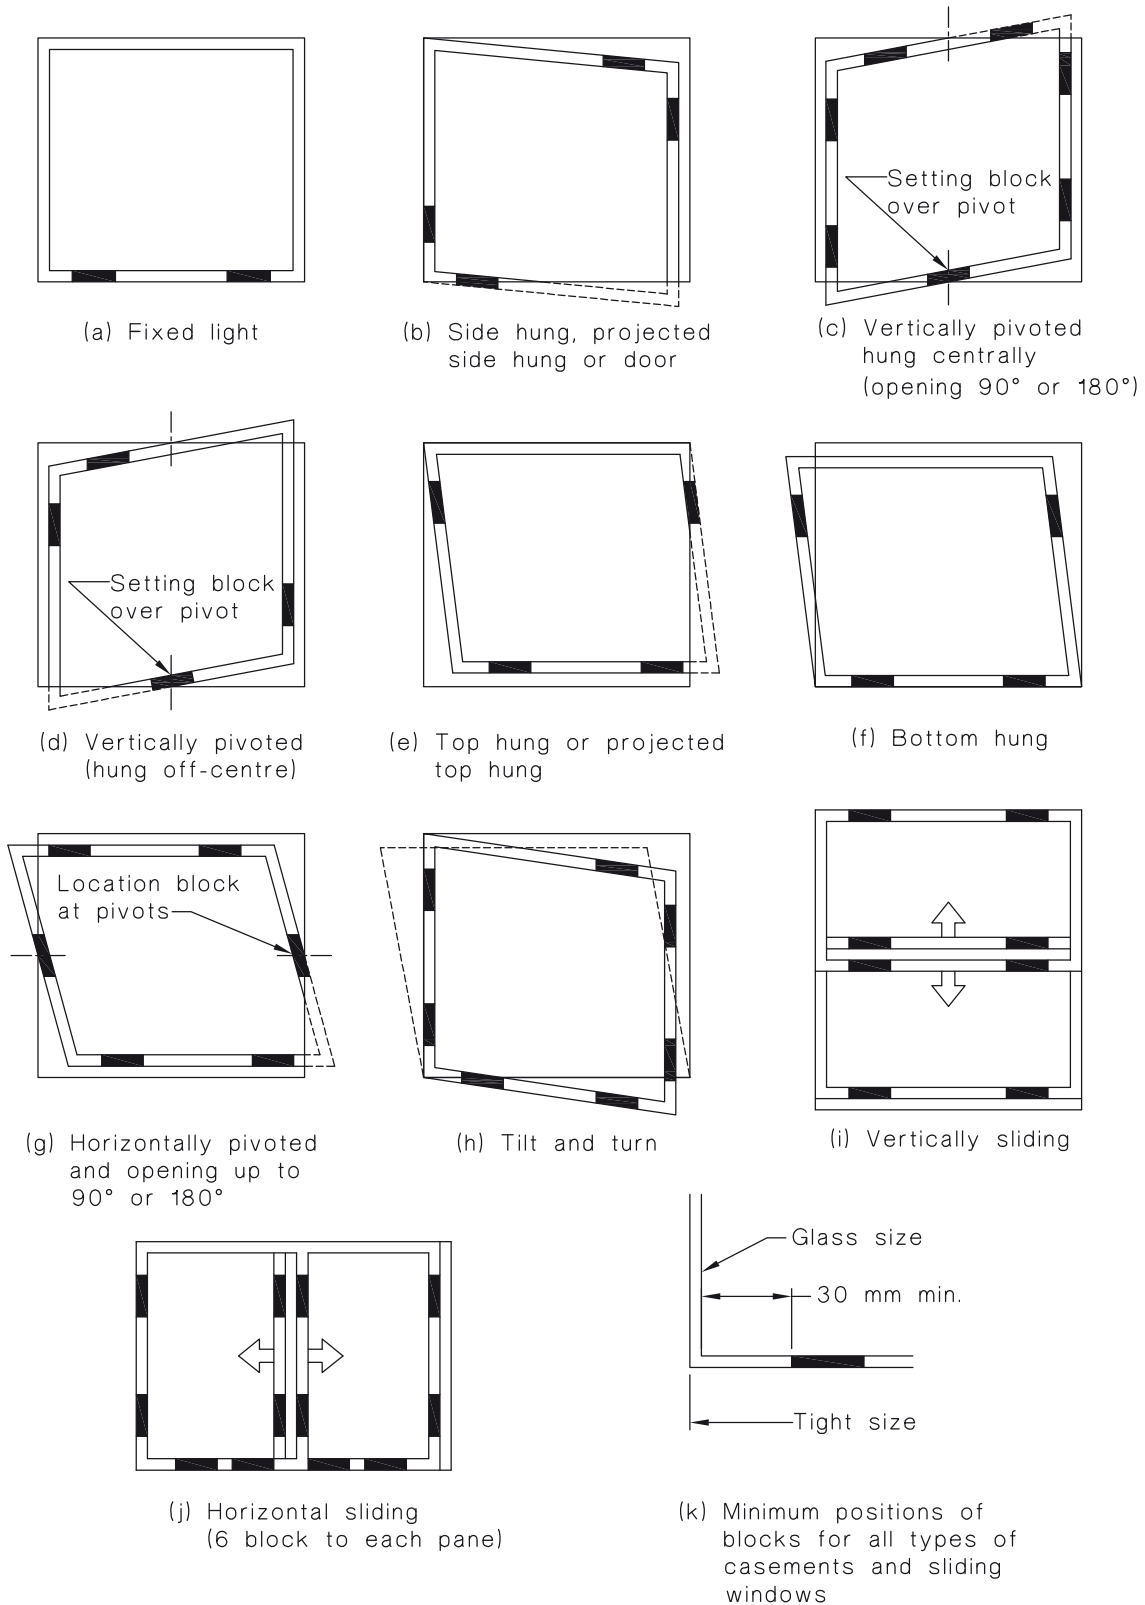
RECOMMENDED POSITIONS OF SETTING AND LOCATION BLOCKS FOR THE SITE GLAZING OF SOME TYPES OF DOORS AND WINDOWS
